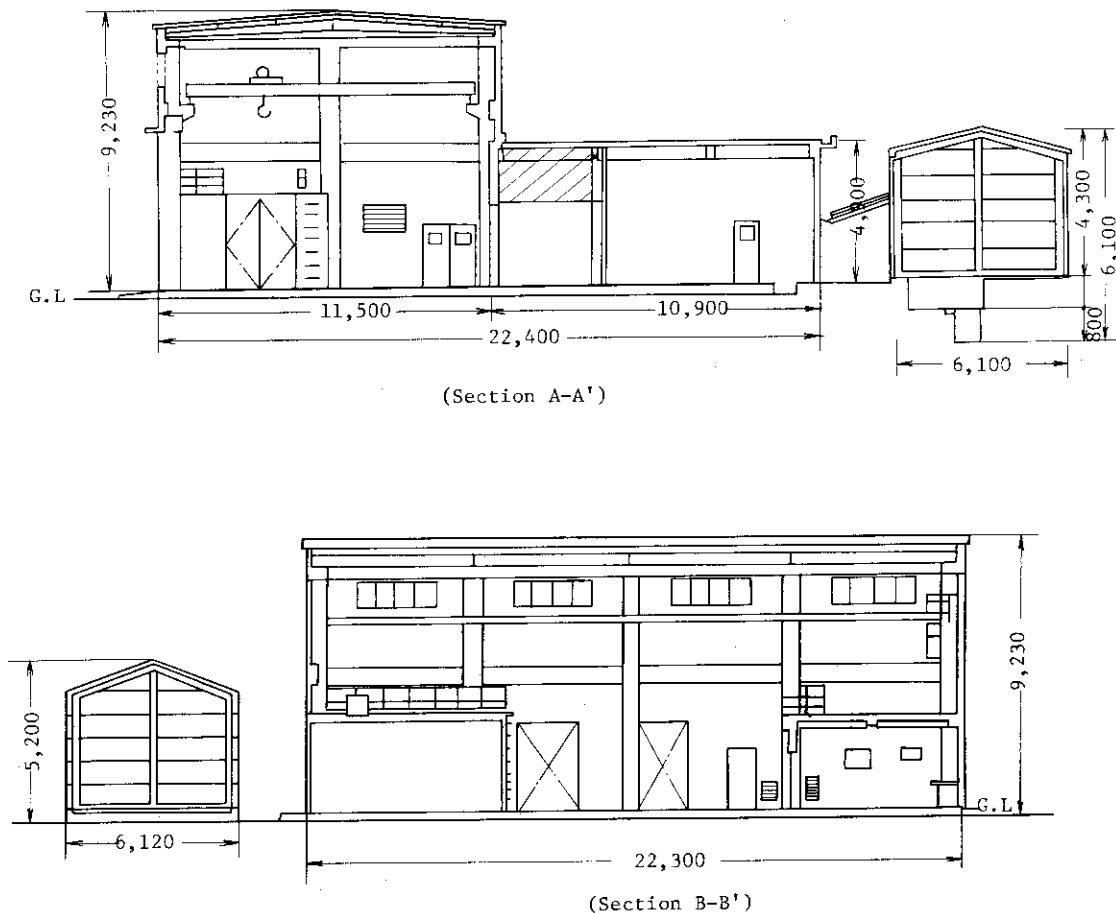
A Sketch of Decontamination Facility
